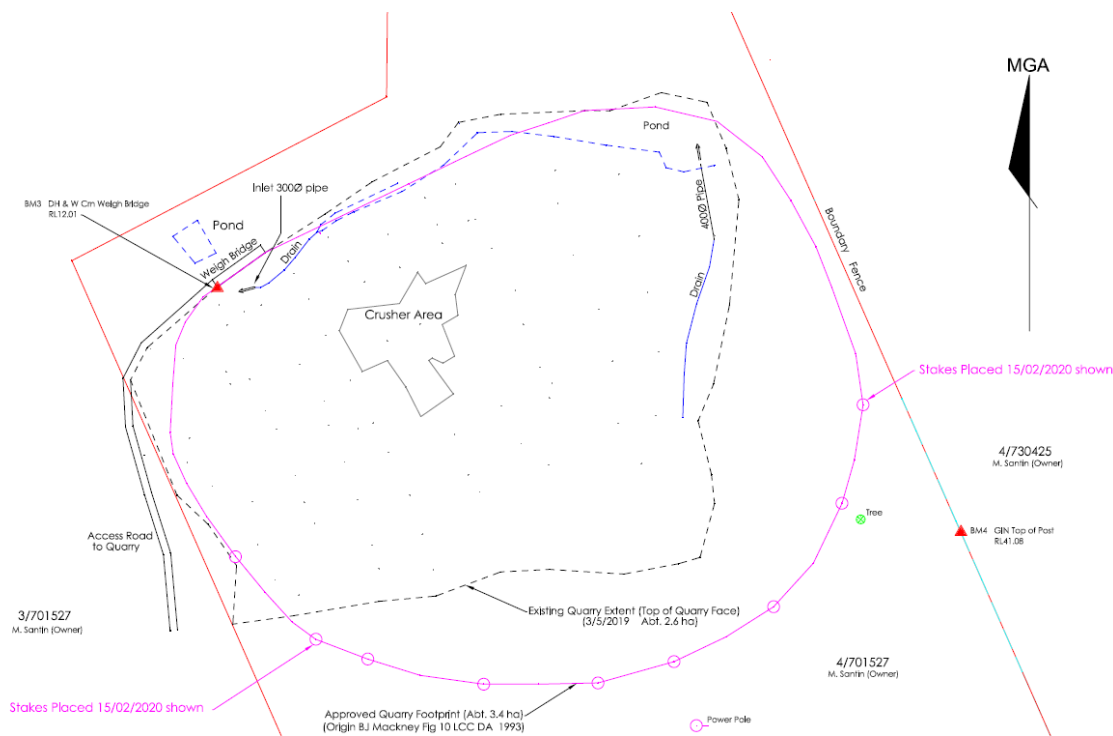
Current Quarry Outline, taken from Staked Limit of Quarry Footprint plan (Plan No. 19/1601 by Wade Engineering Surveying)
